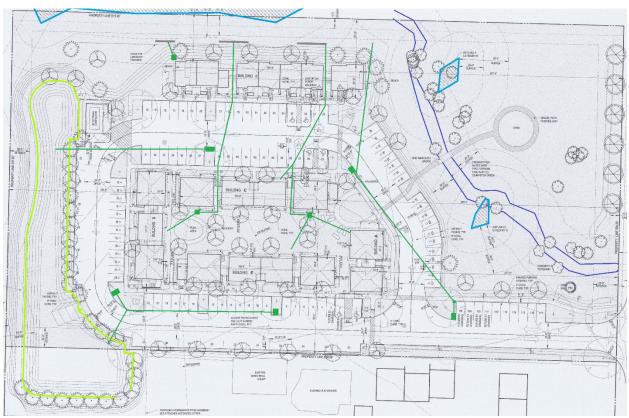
Plan drawing of the HASC Family Housing project area. North is to the left. The green boxes and lines indicate the approximate locations of 8 Filterra stormwater treatment units and the related pipes. A stormwater detention pond is outlined in yellow at the north end of the property. Trumpeter Creek is not shown, but is north (left) of the detention pond. The high water lines of College Way Creek are indicated in dark blue, and light blue indicates wetland areas (Adapted from Environmental Works 2020).
